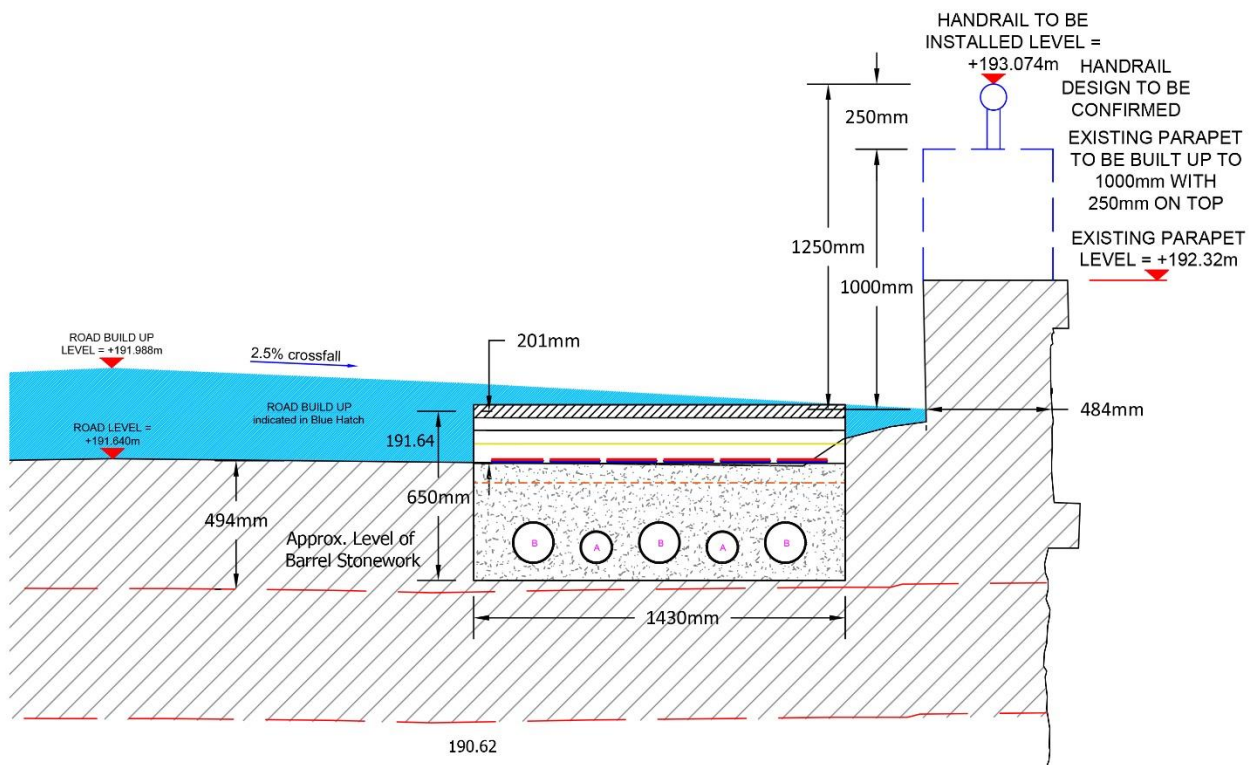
Option 3, raising the parapet by adding a stainless steel railing.
